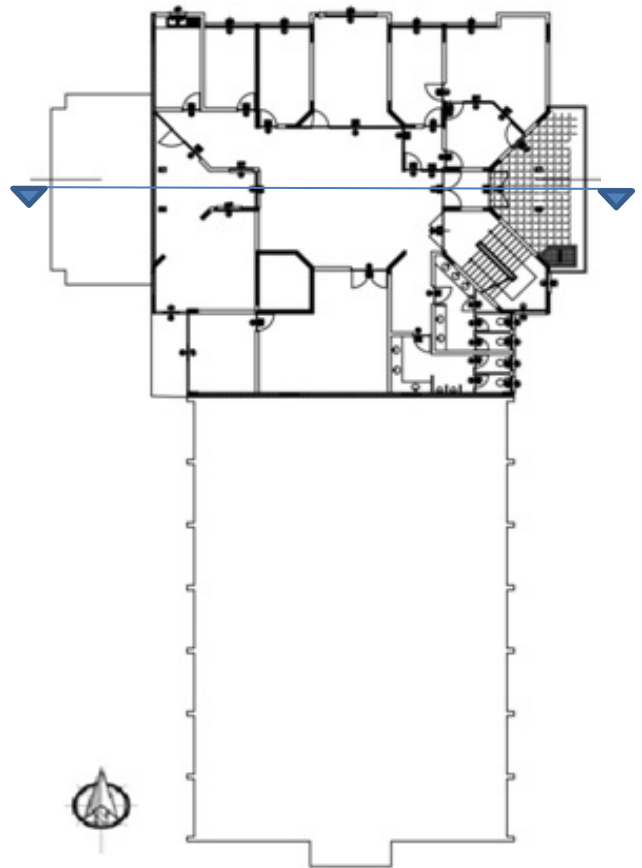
Ground Floor of Health centre Building (SC 1/500)
